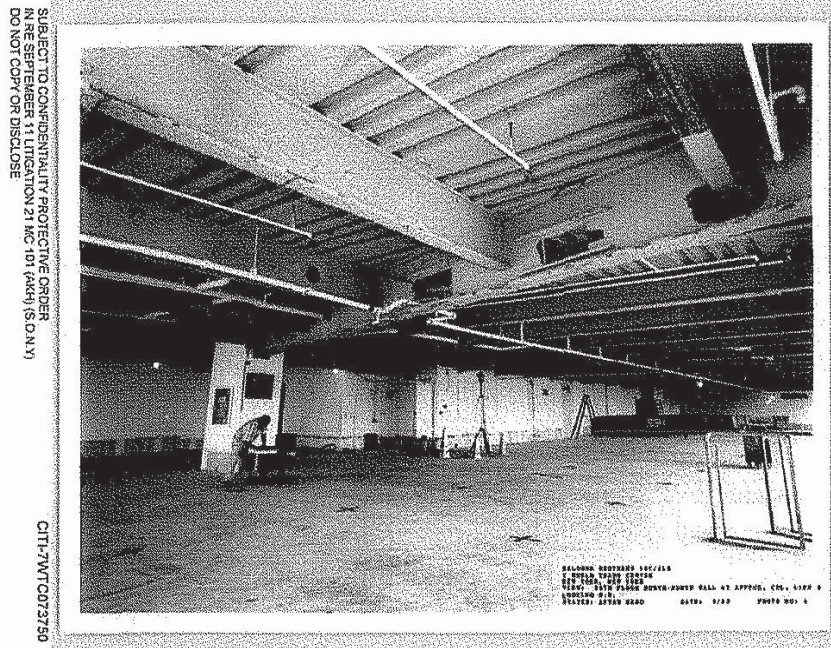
Photograph on 24th floor showing unfilled flutes above girder
